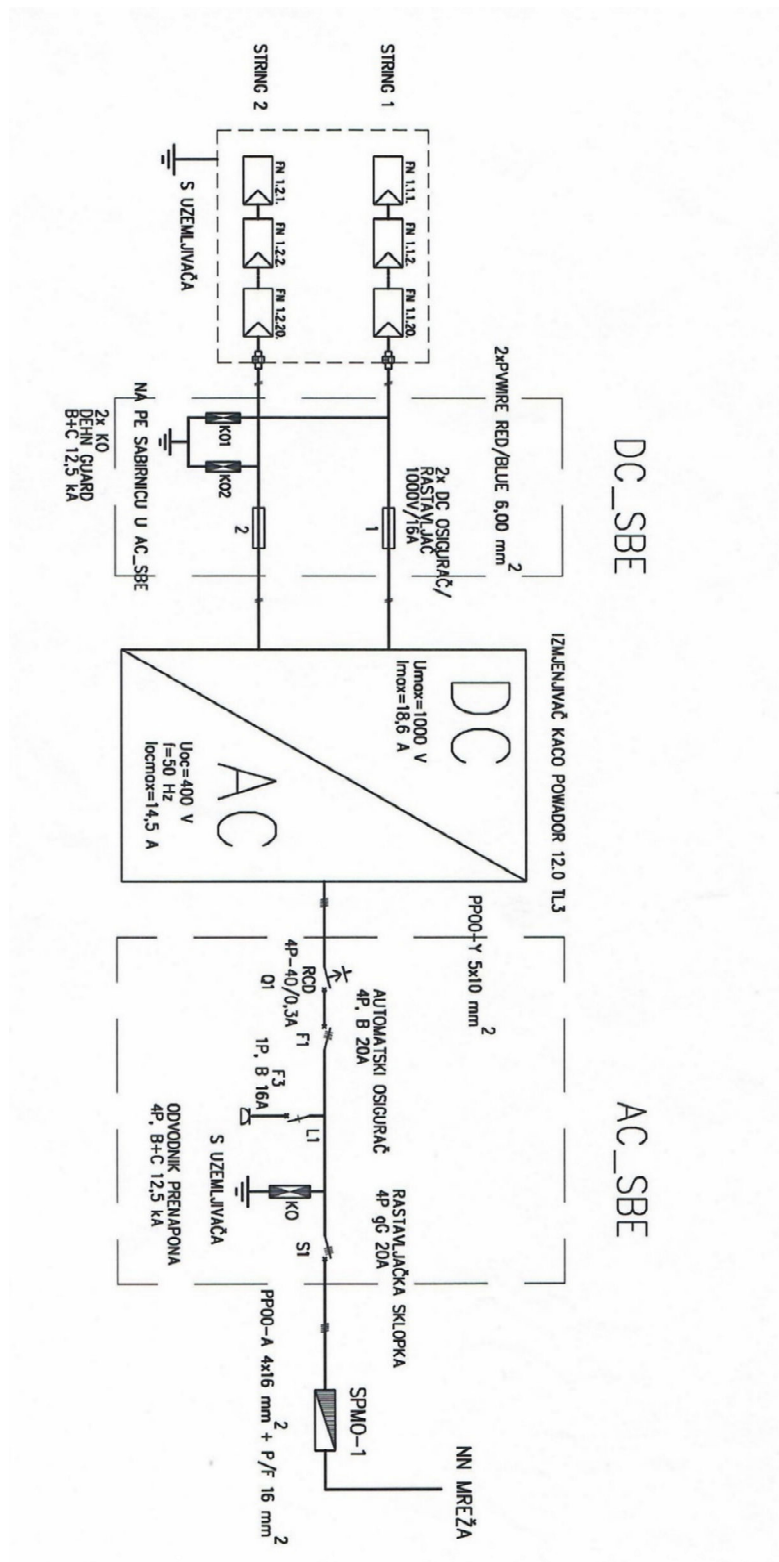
Single line diagram of 10 kW photovoltaic plant on the building roof in Trpimirova street.
